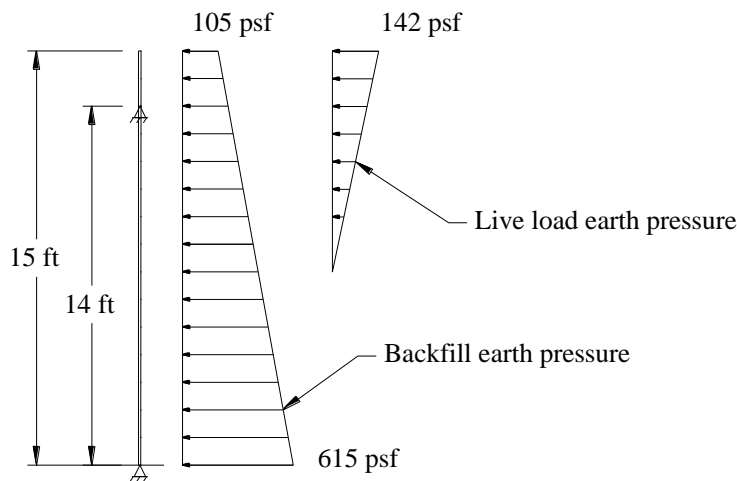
Lateral loading diagram for analysis of sheet pile wall
